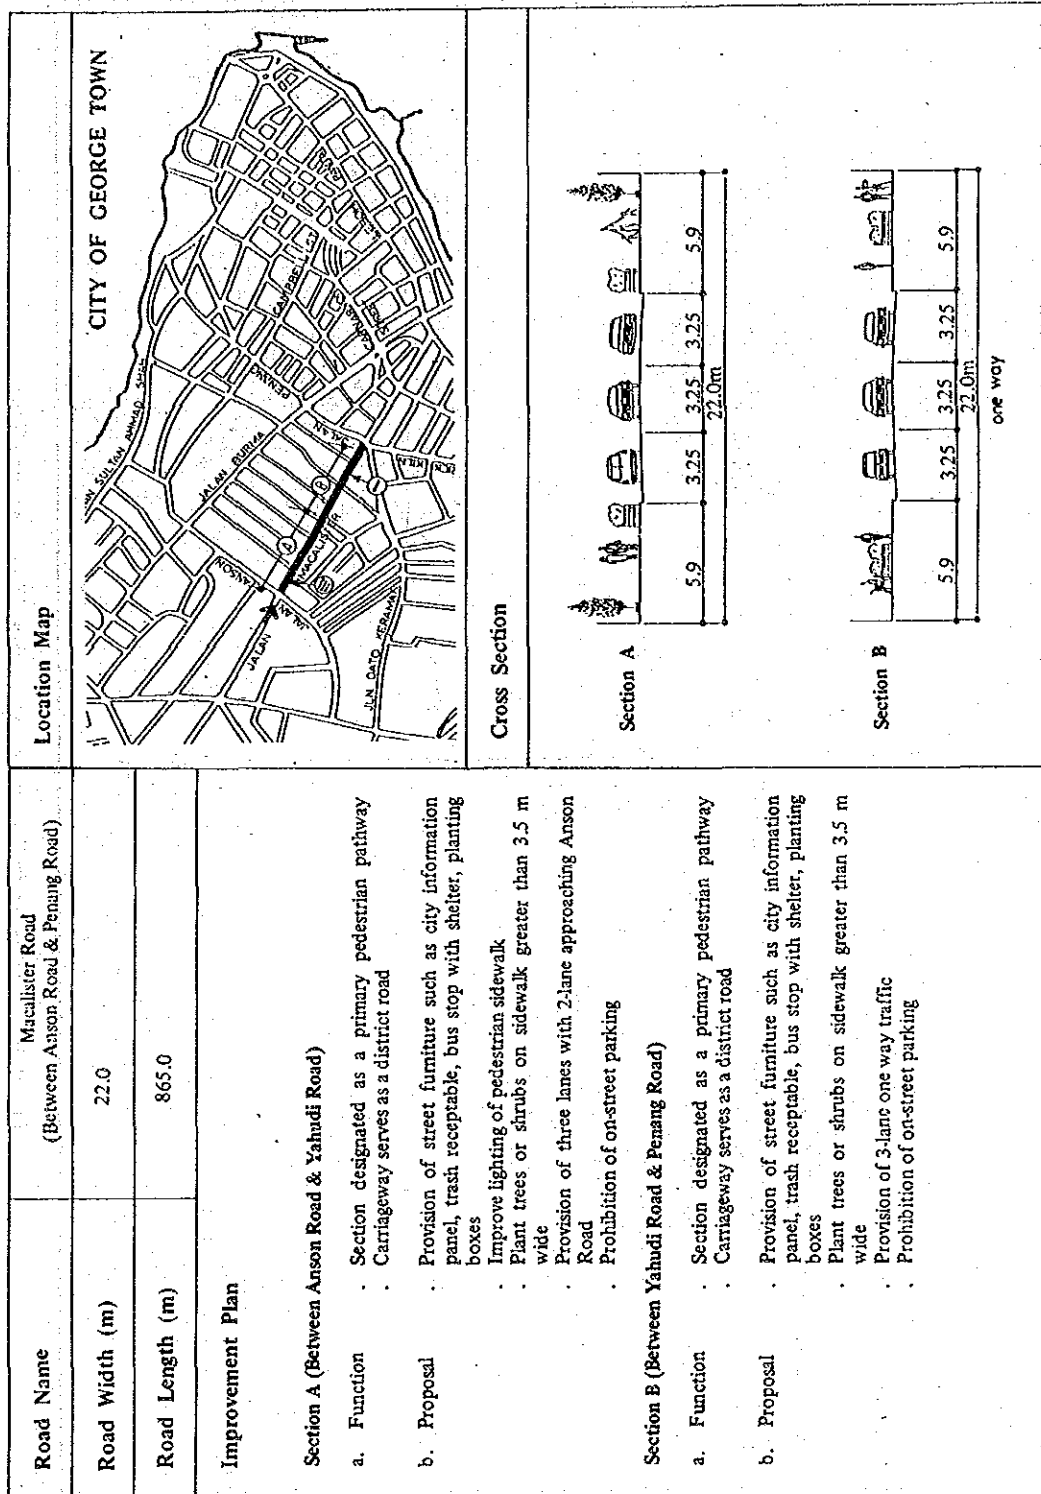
Pedestrianisation Improvement Plan (14) – Macalister Road
